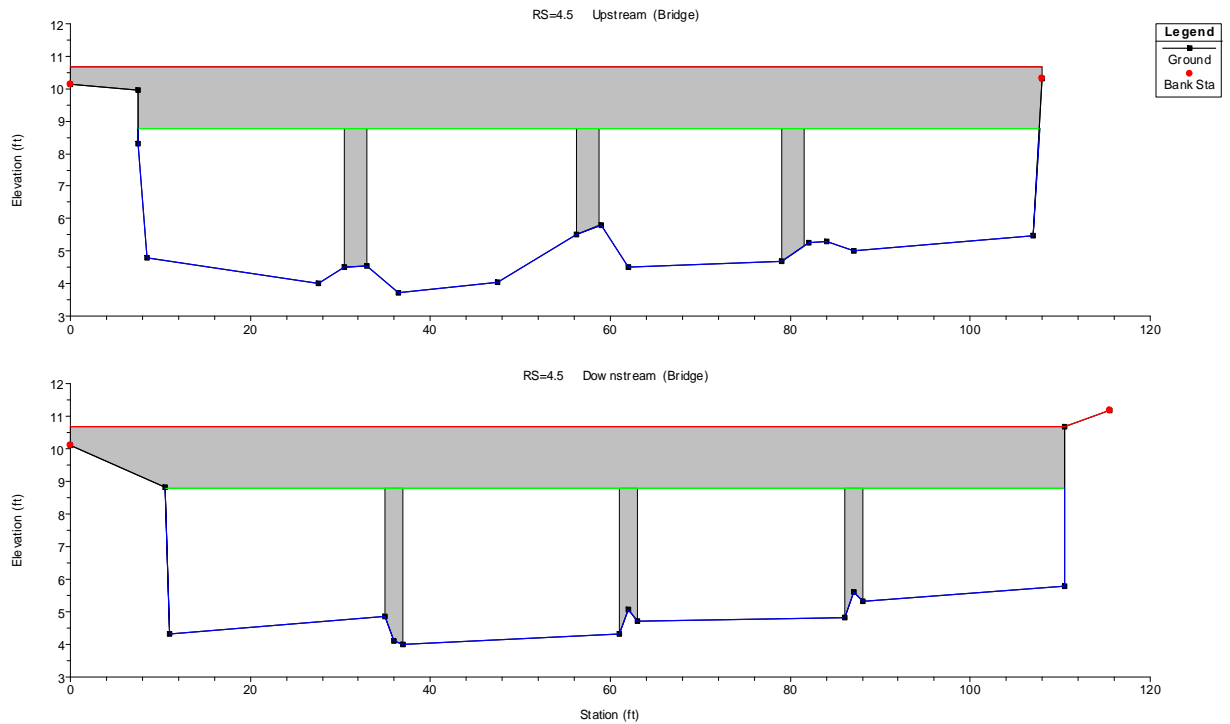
Bridge cross sections. Upstream cross section shown on top and downstream cross section shown on bottom. Blue line represents channel bottom, green line represents bridge low steel, and red line represents bridge deck. Cross section view is from upstream looking downstream.
